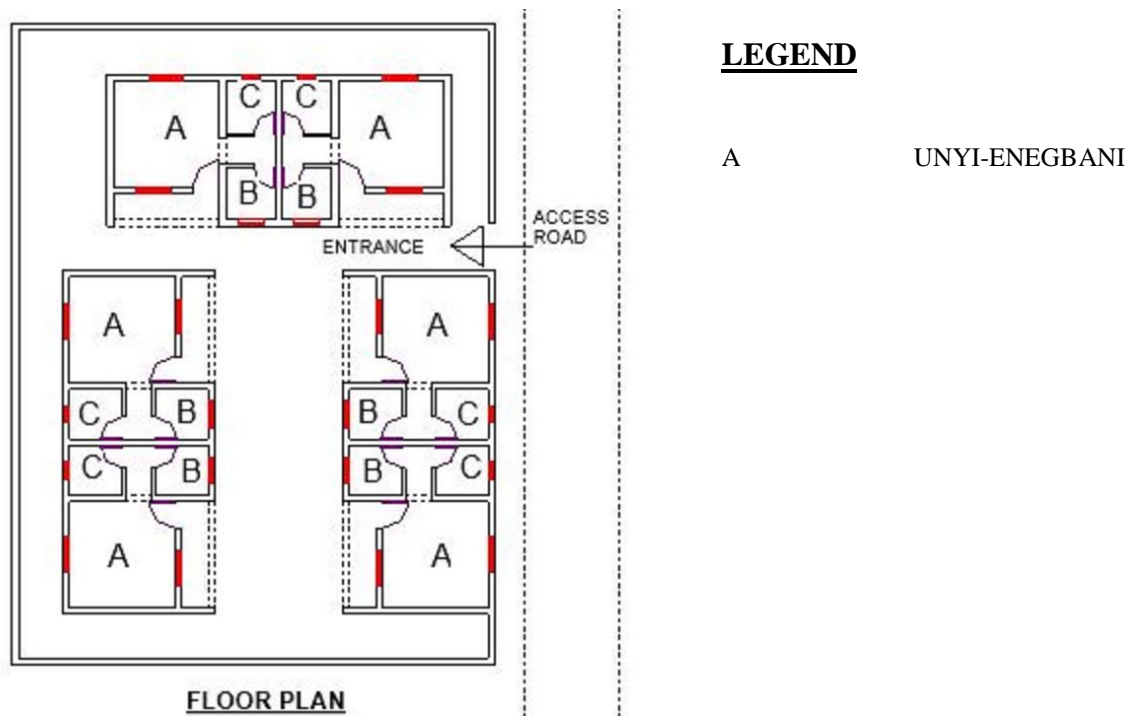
Plate IV: Typical Floor plan of Aji-Tachi and Obeya Community
